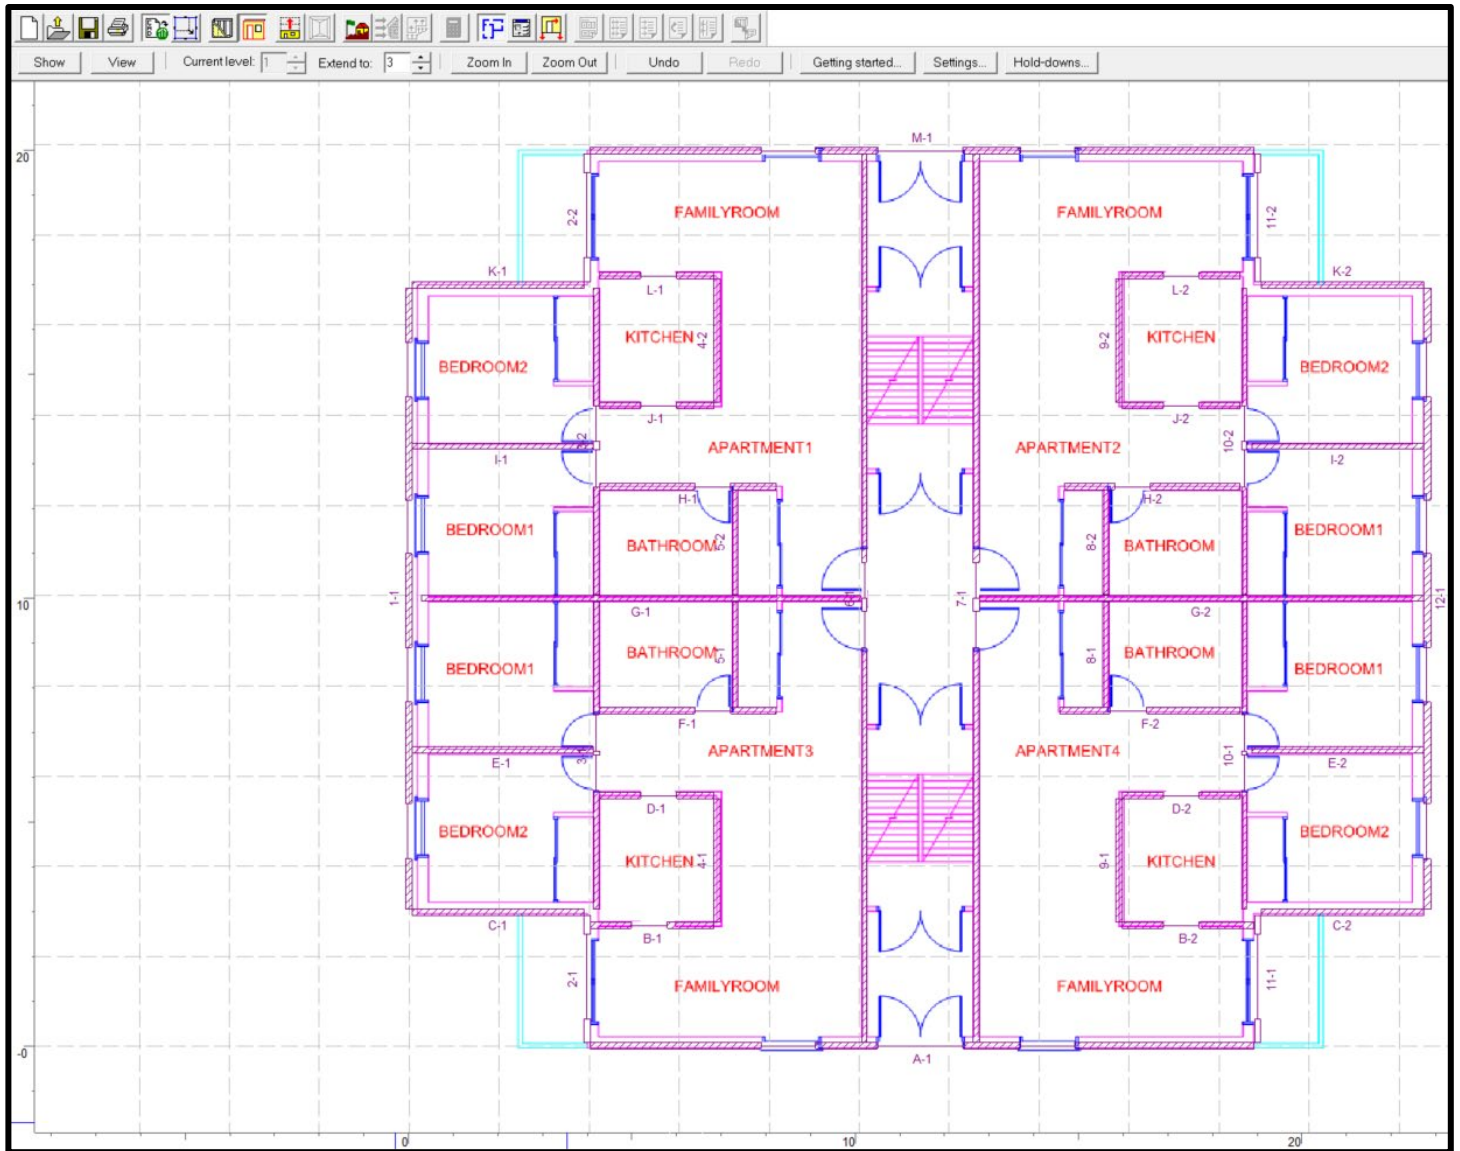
Shearwalls Tutorial 6 – Level 1 Door and Window Openings (With CAD Drawing)
